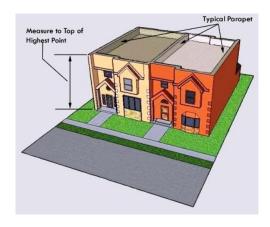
E.2: MEASURING HEIGHT FLAT ROOF WITH PARAPET
